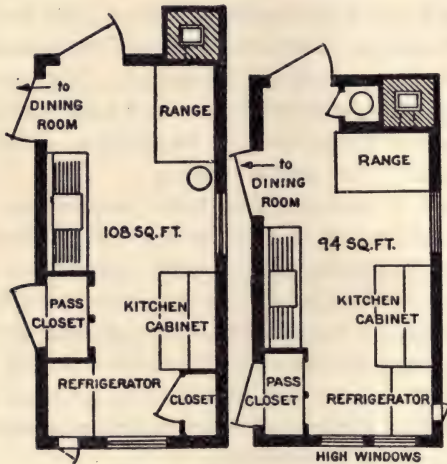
The plans above of rectangular kitchens show carefully studied arrangements. Note the easy access from range to dining room, sink to dining room, and refrigerator to pass closet. (Courtesy of the U.S. Department of Agriculture.)
